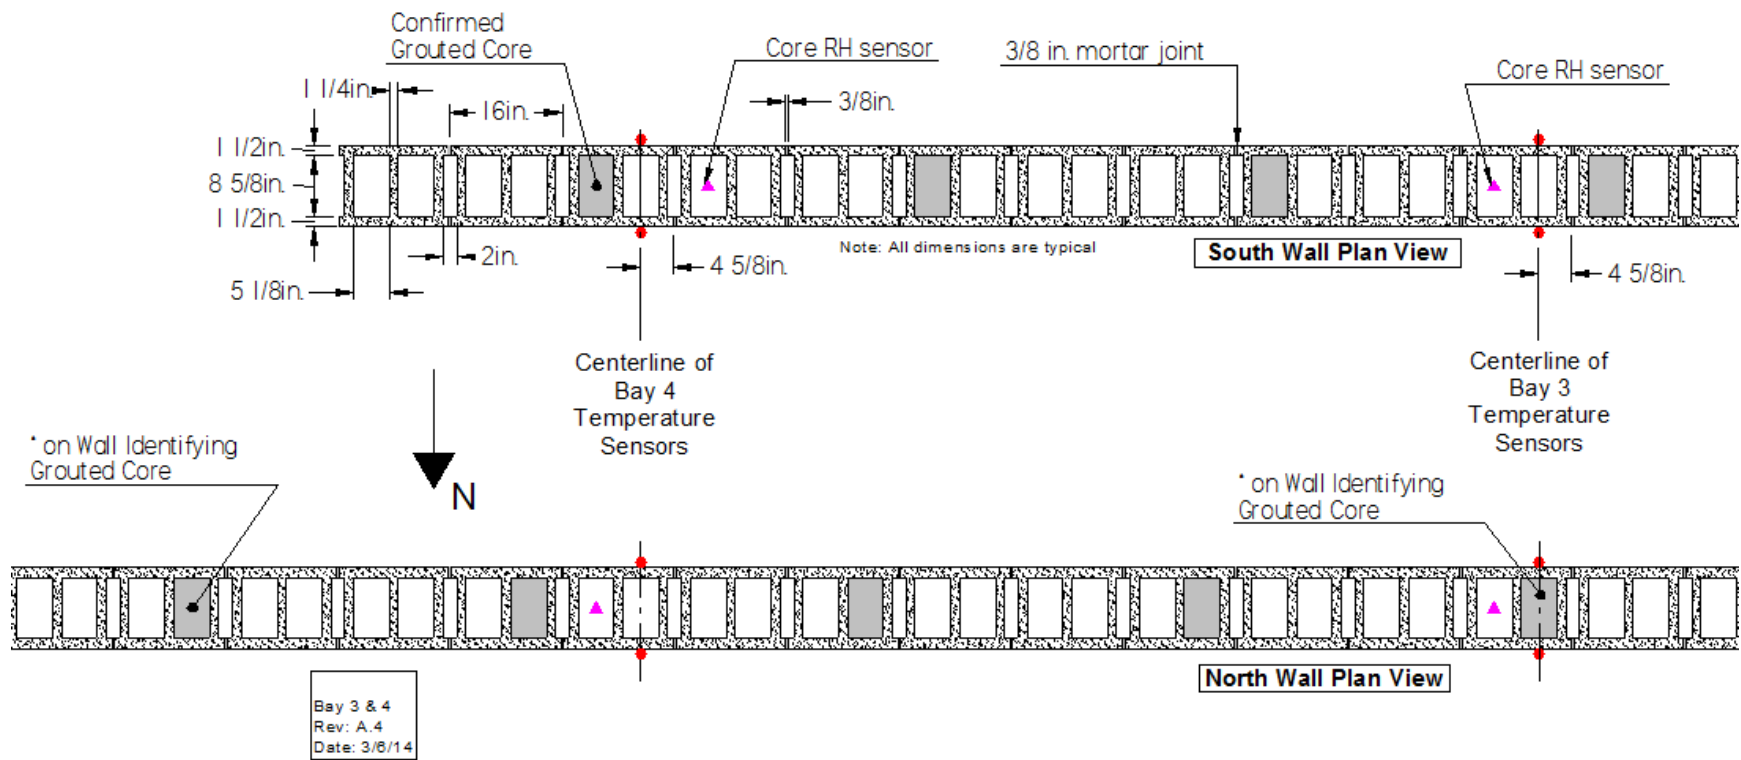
Wall Sensor Layout for Bays 3 and 4 North and South
